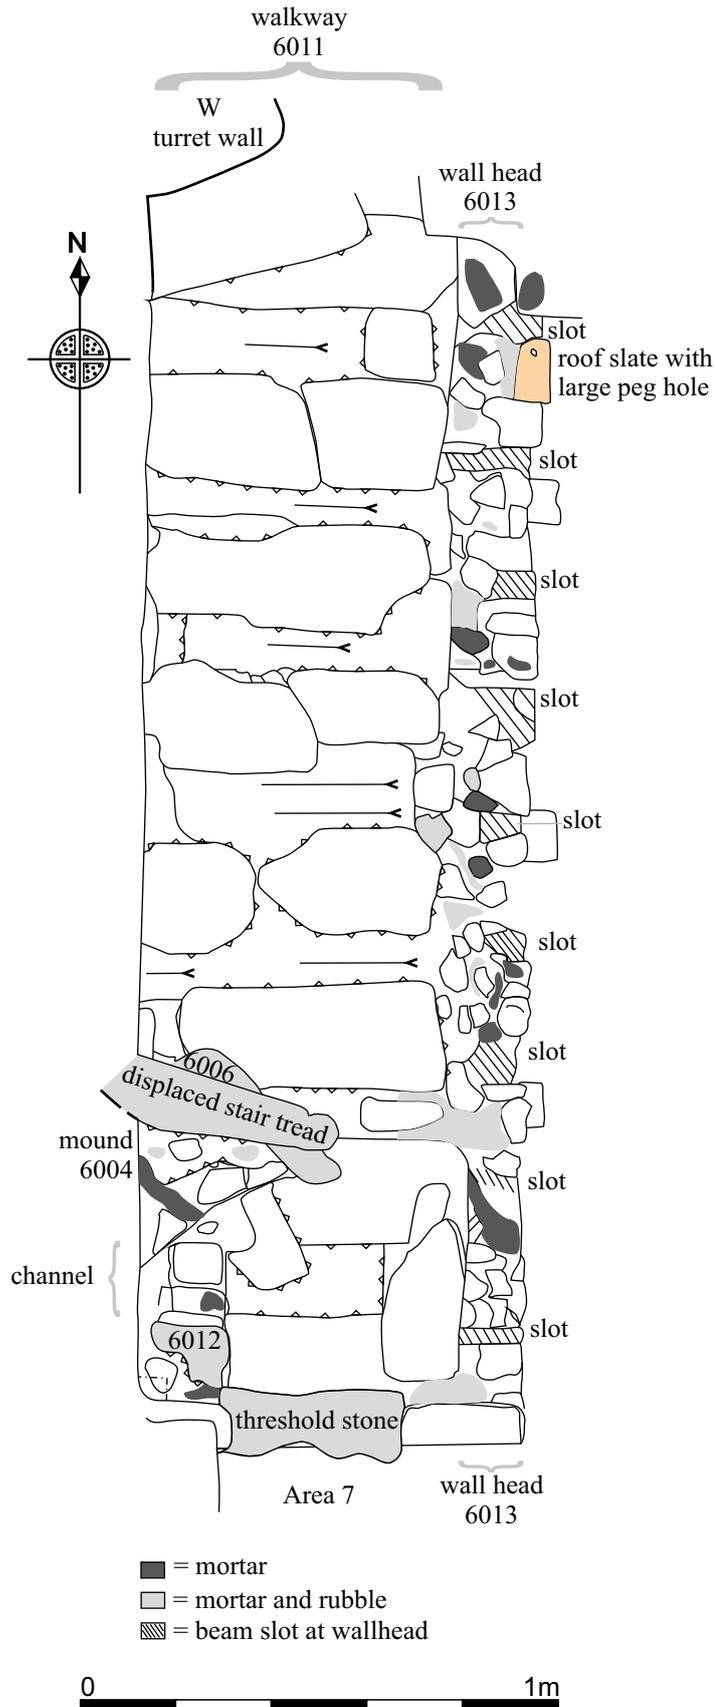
Area 6, west walkway slabs after removal of slates and deposit (6009) showing slots for transverse floor beams
